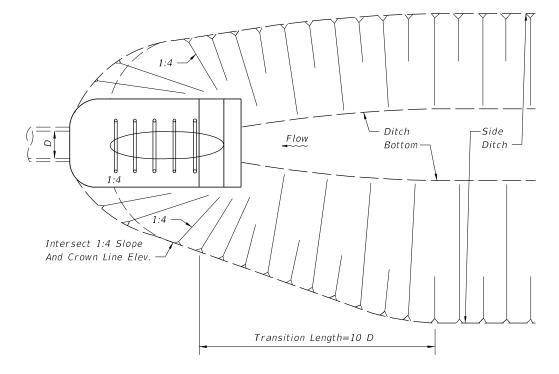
## DETAILS FOR CONCRETE & CORRUGATED METAL PIPE
